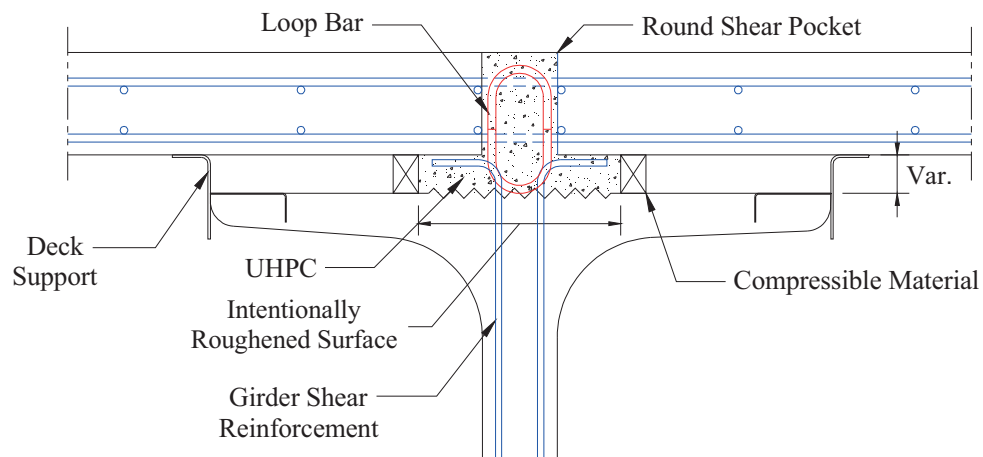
Proposed Precast Concrete Deck-To-Concrete Girder Connection
